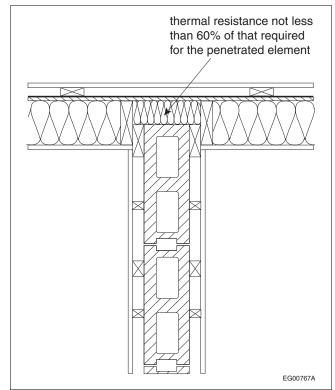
(2)-B Penetrating element insulated within exterior wall
